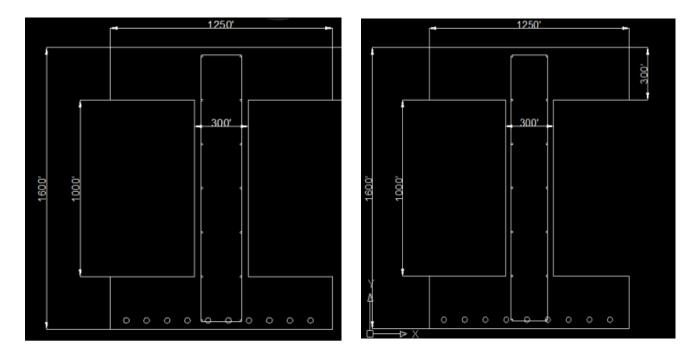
REINFORCEMENT DETAILS FOR RCC I GIRDER
